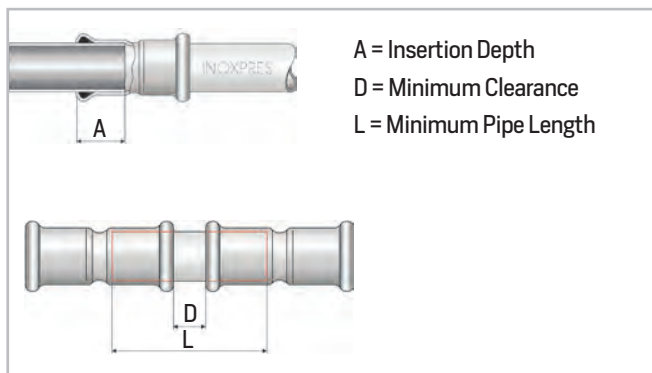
Minimum Insertion Depth and Joint Engagement Dimension
